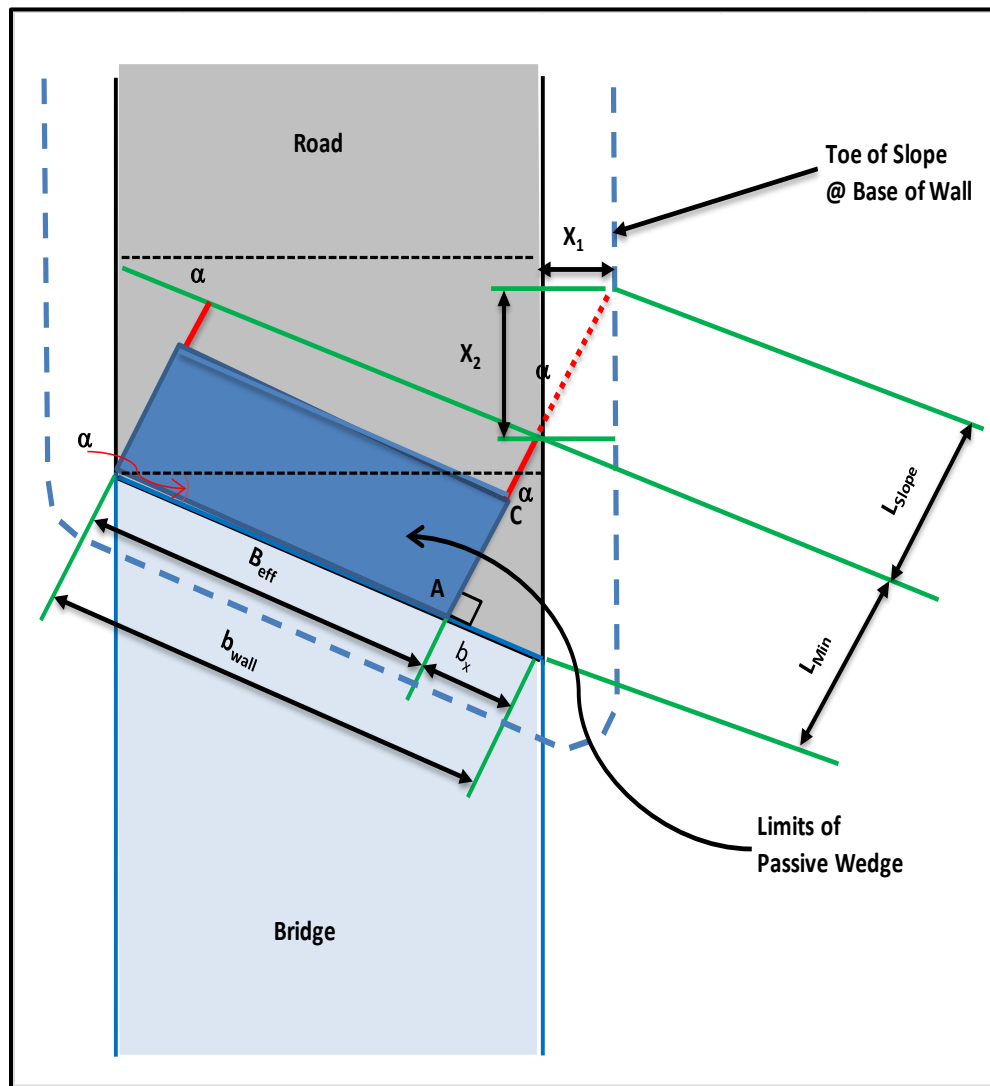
, Skewed Bridge Abutment Wall Seismic Passive Resistance
